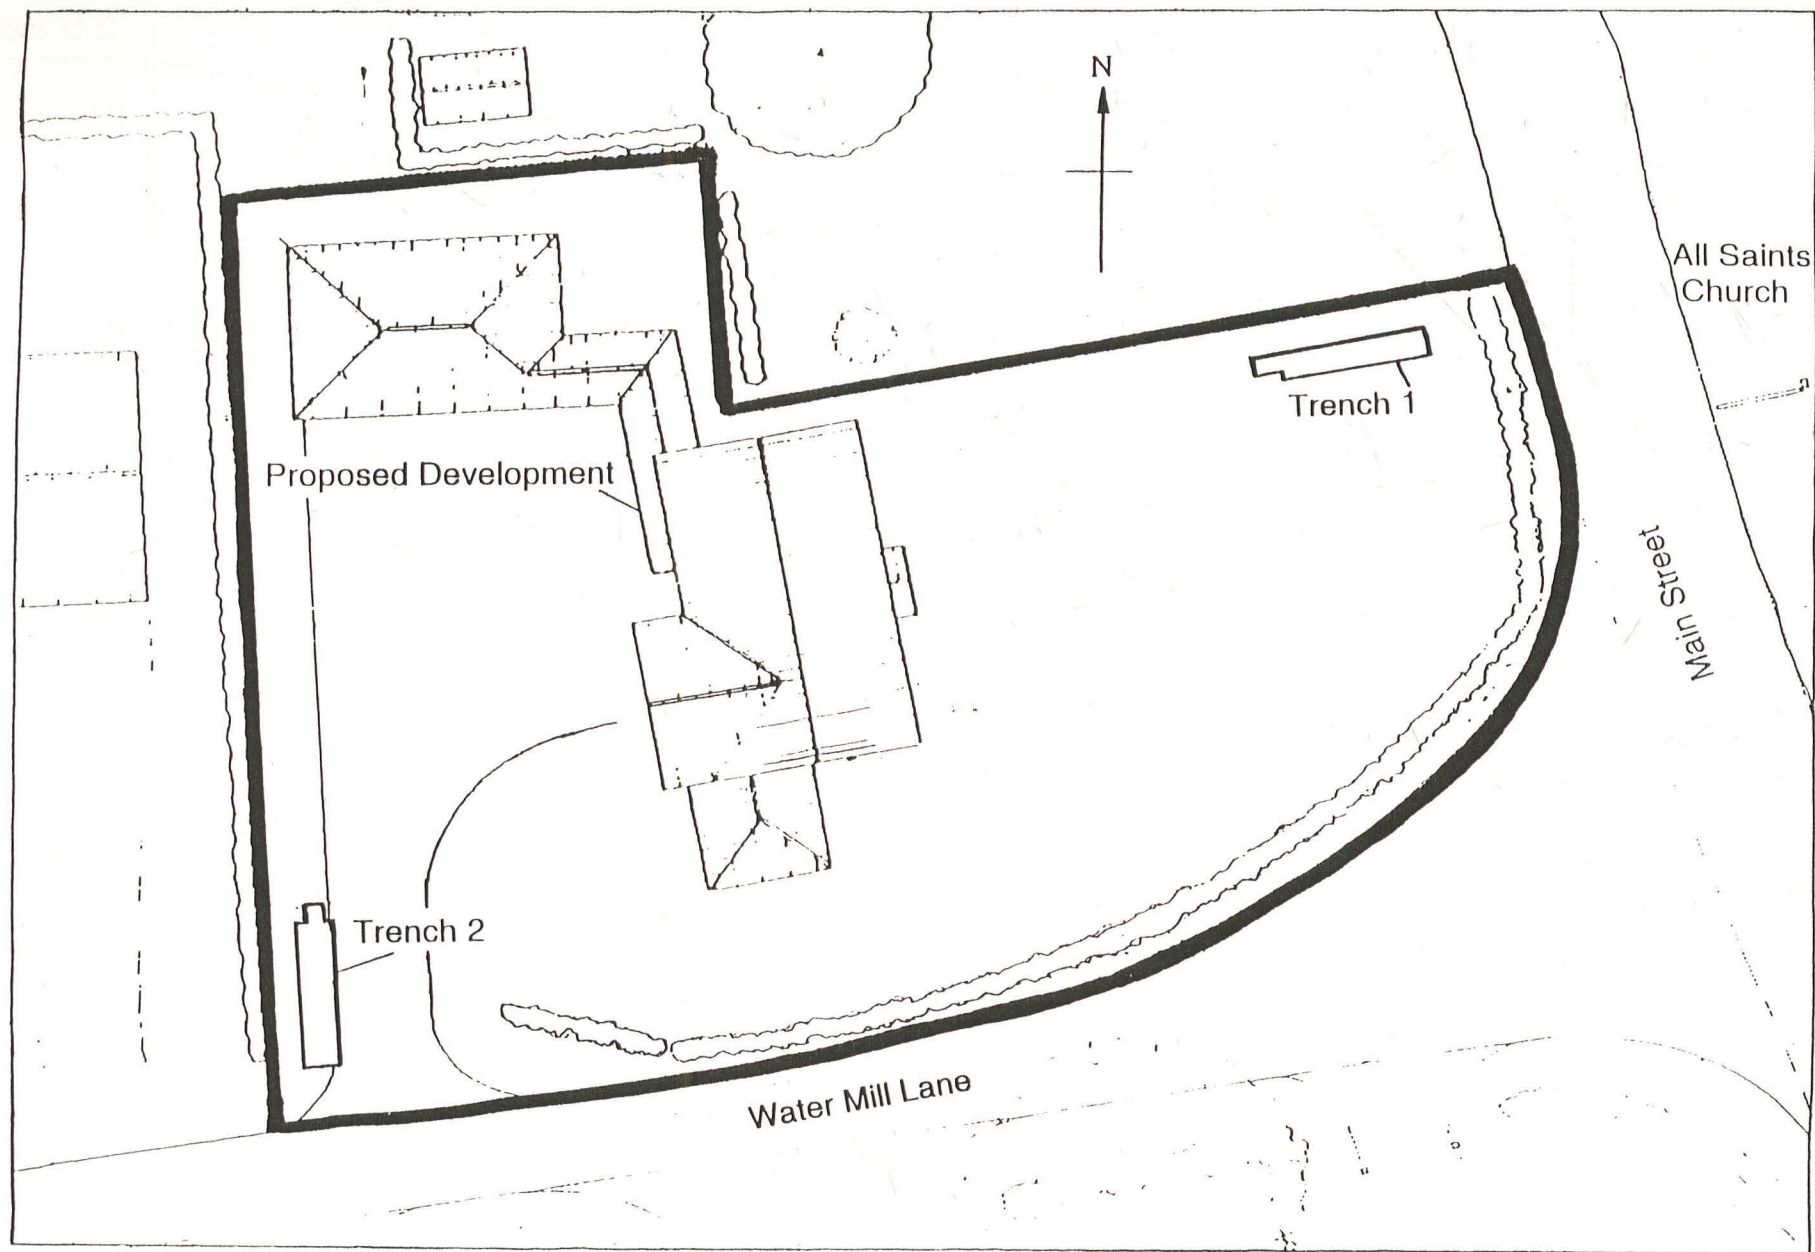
Plan of proposed development showing trench locations (Based on a plan supplied by the client).
